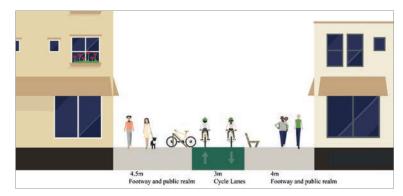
High Street Indicative Proposals (narrow cross section) (© Street Mix)
